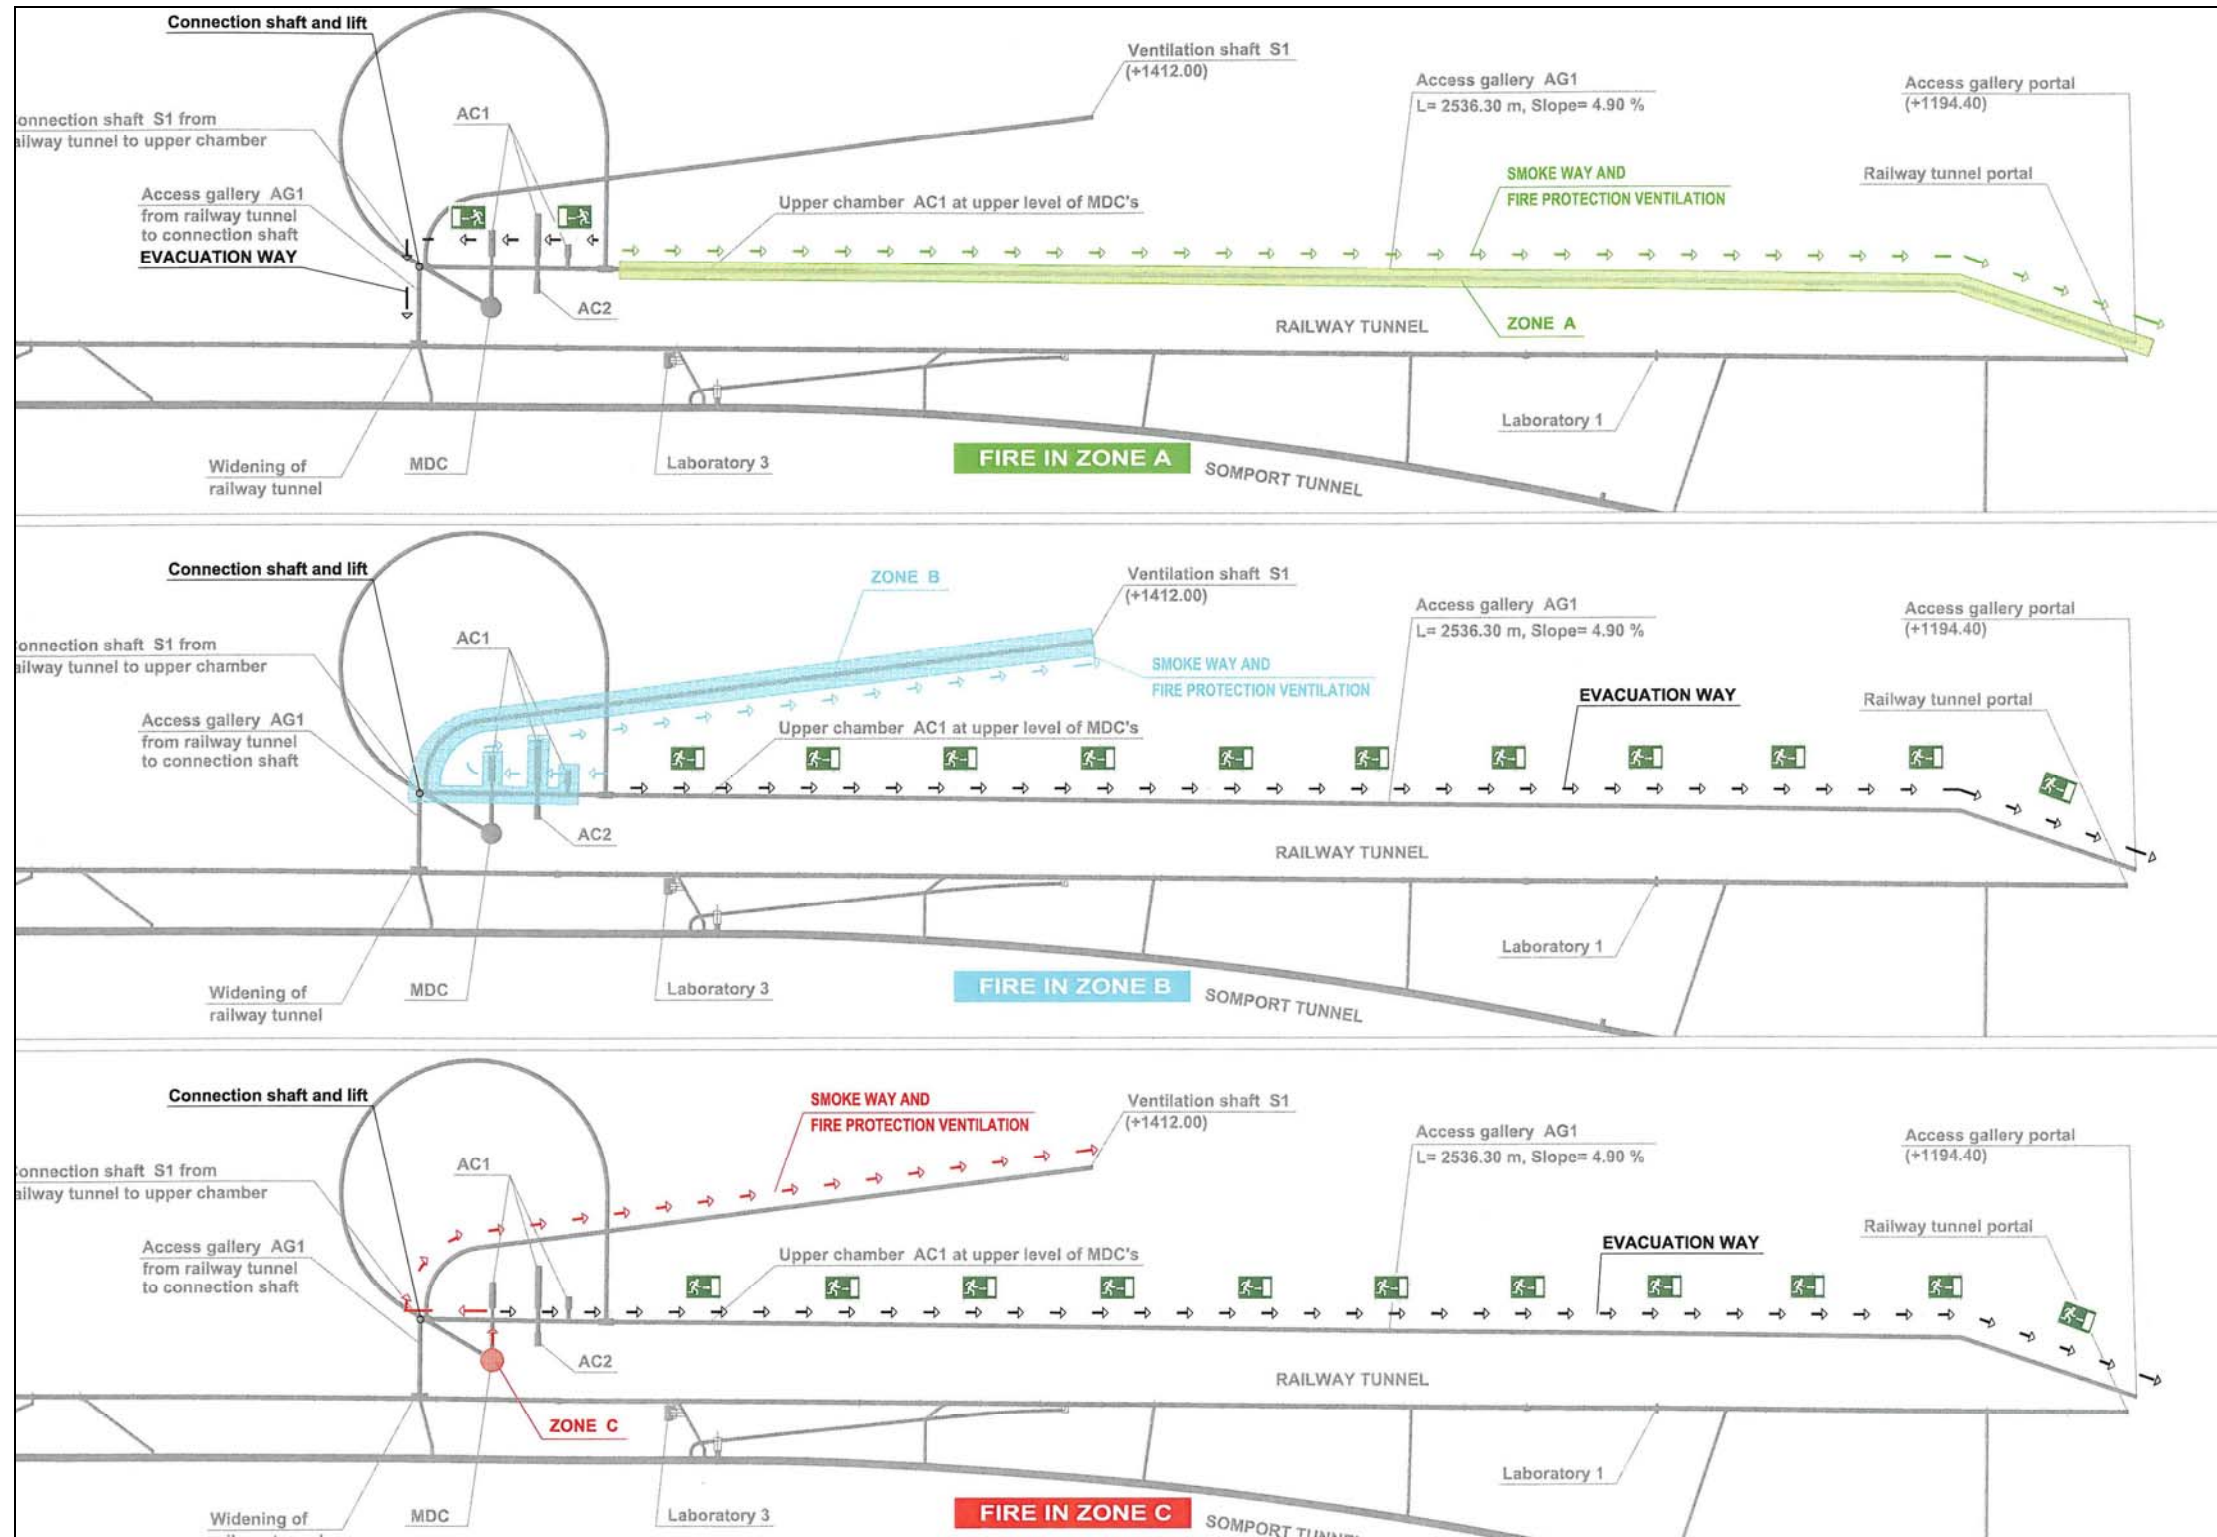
Evacuation plan and fire protection ventilation system.
